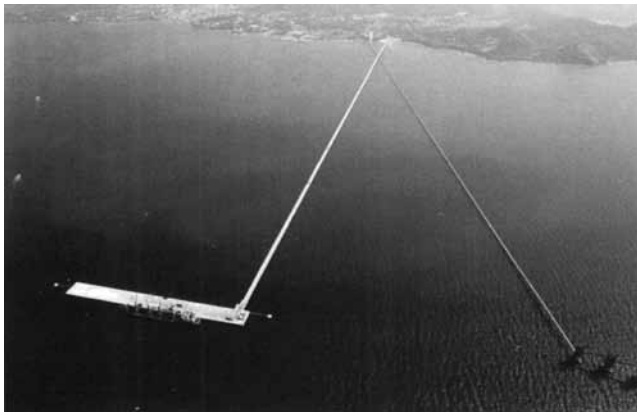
Typical plan of open piled jetty (Source: HR Wallingford)
